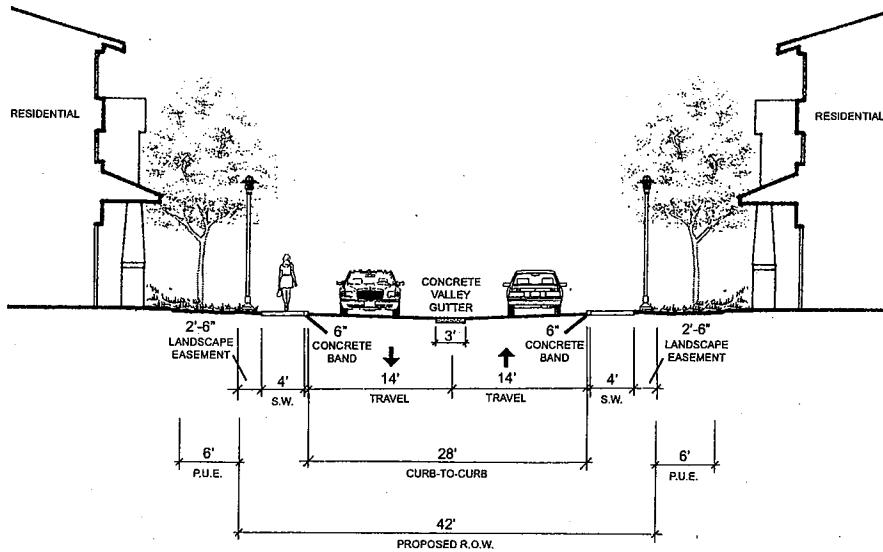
D.30: Cross Section of Typical Private Entryway at T-Court (3)
